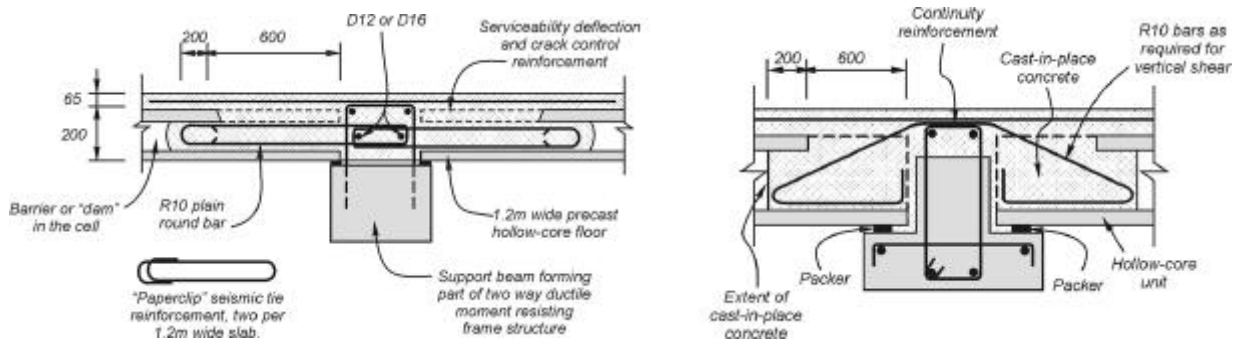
Examples of support and special support reinforcement at ends of precast concrete hollowcore floors (Centre for Advanced Engineering, 1999)
